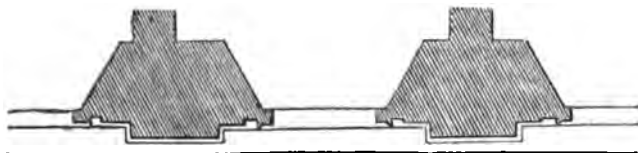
Plan of Ground Floor Windows and Balustrade.
